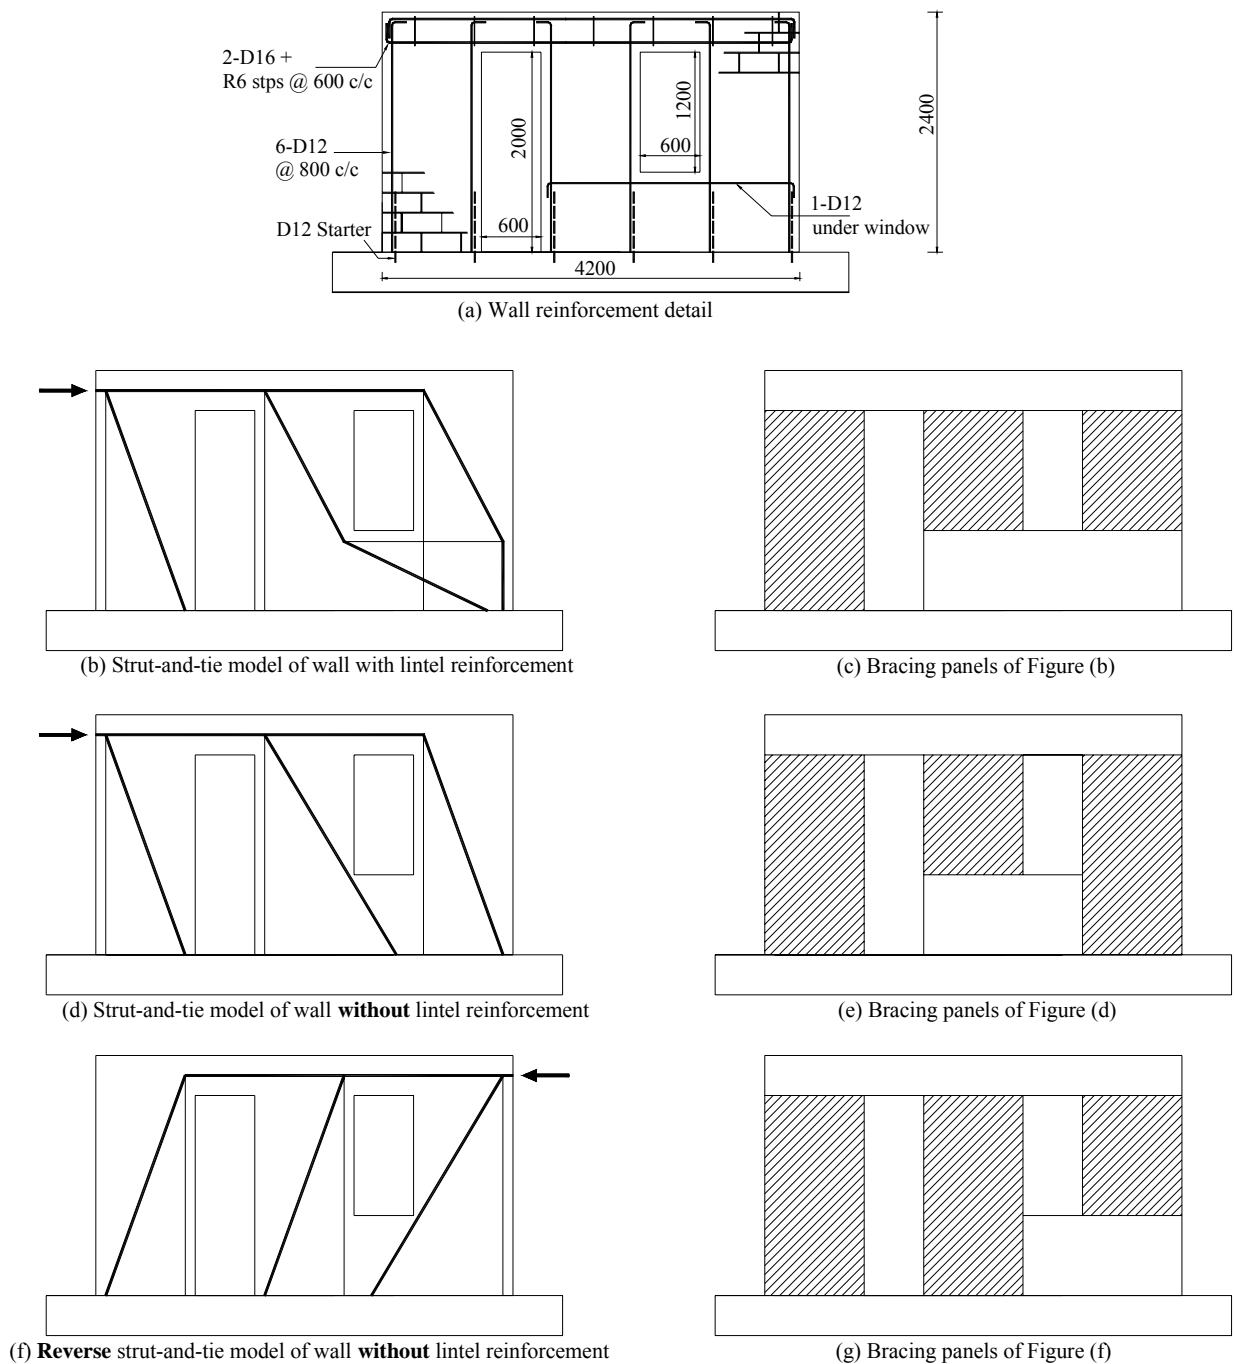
Strut-and-tie modelling of nominally reinforced concrete masonry walls.
